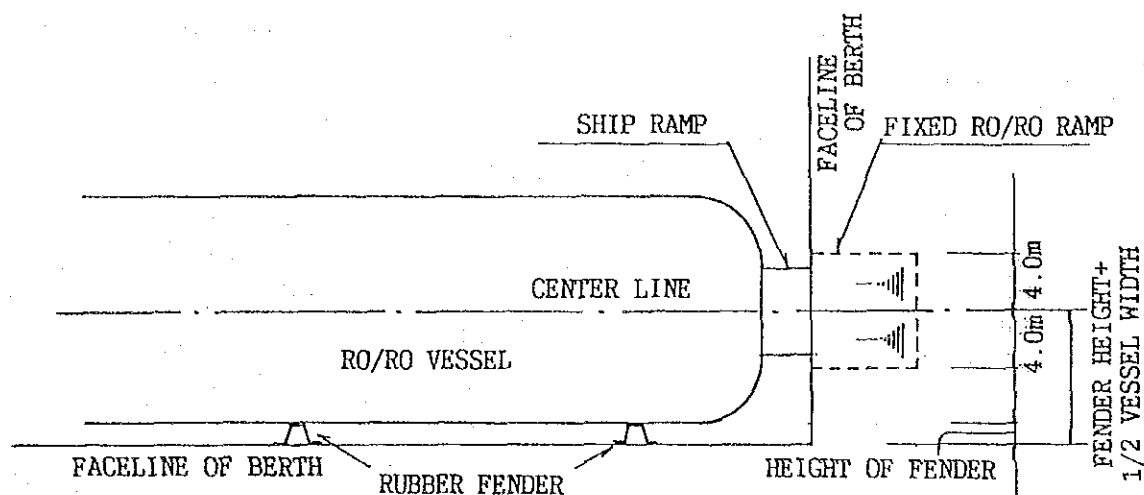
Sketch of the Required Width of Ro/Ro Ramp
